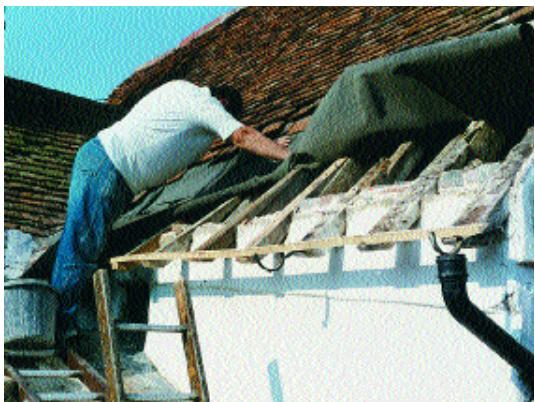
Rebuilding sprocketed eaves following deterioration of the timbers. The beam-filling above the wall plate carries the sprockets. The open eaves have no soffit. (When the photograph was taken, the ladder was, correctly, tied to the building, but the roofer should have been wearing a safety harness.)
